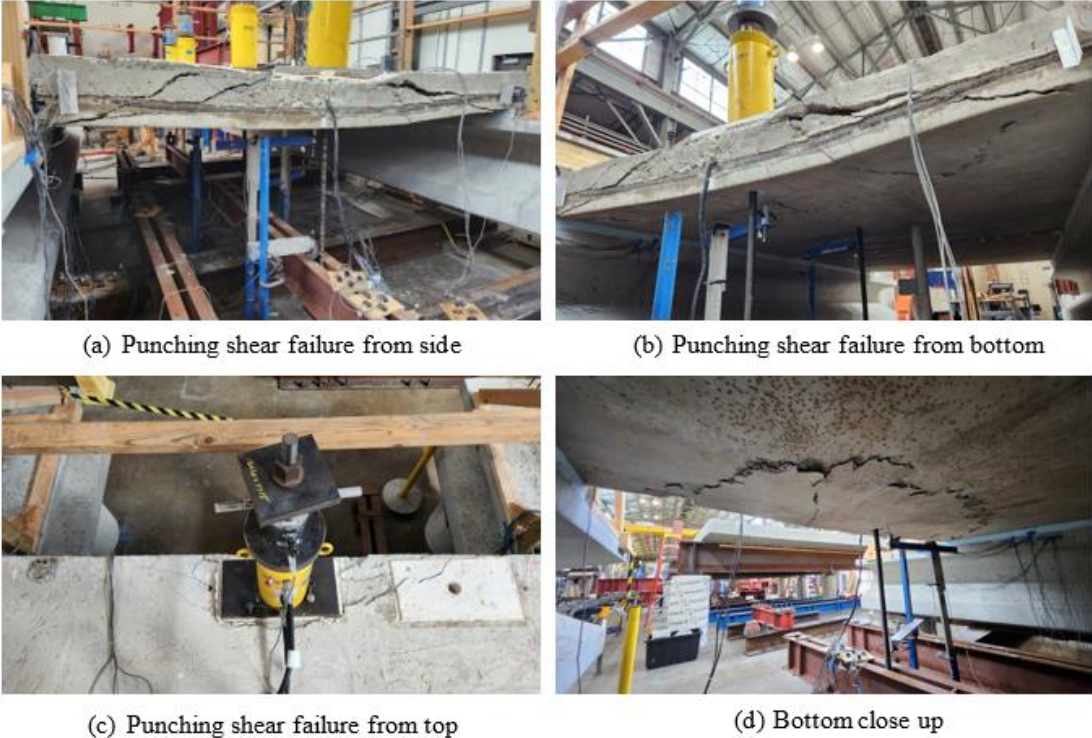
Test 5 – Hand-Welded Panel Pair Positive Moment Long Span – Punching Shear at Ultimate Load
